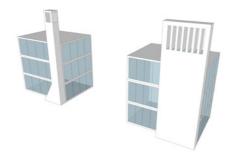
A windcatcher intake opening can be built parallel to one face of a building and can be as wide as the whole face of a building or as one portion of the face.
